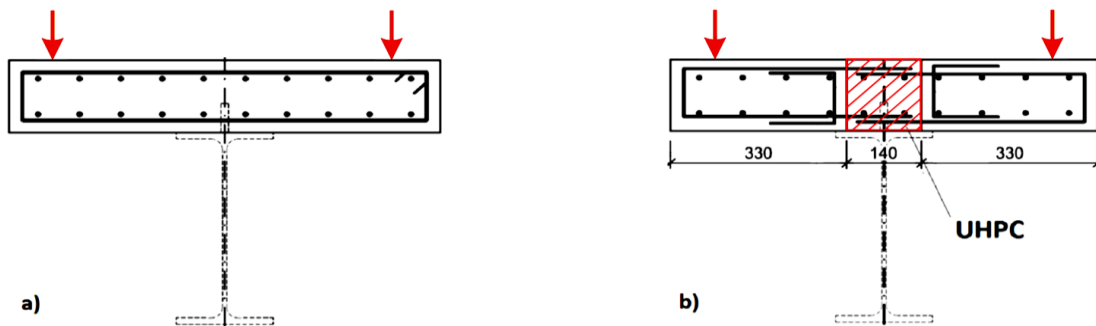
Cross-section of the beams. a) Type 1, b) Type 2
